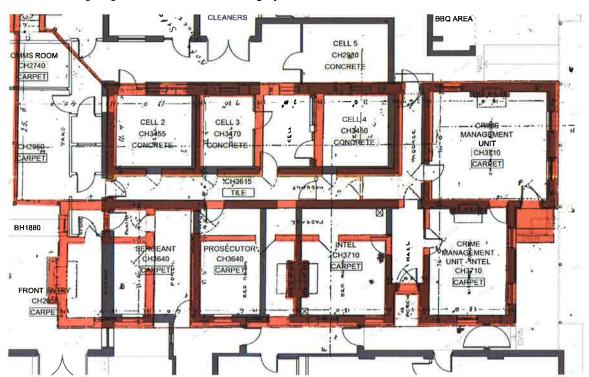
Overlay of original 1884 floor plan of lockup and lockup keeper's residence (shown red) and current floor plan of building (shown black). This shows the extent of walls removed, original openings blocked up and new openings created. (Source: NSW Government Architects Office Archives and Brookfield Global Integrated Solutions, 2016)
